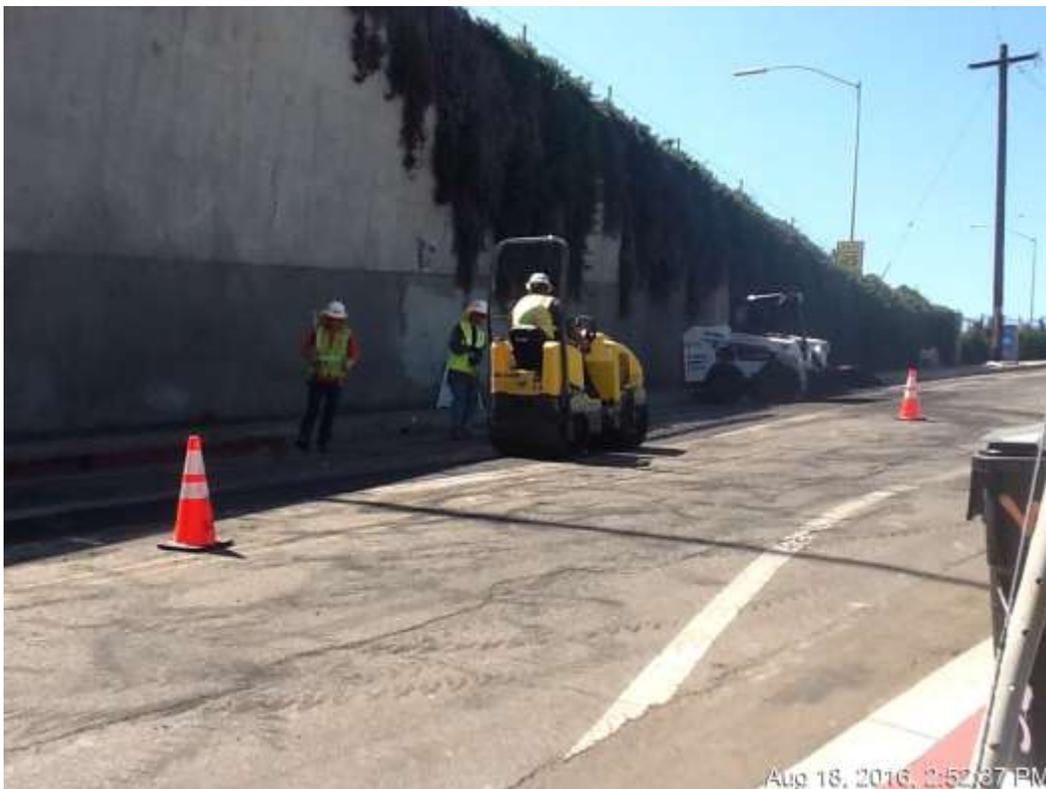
Temporary paving of the completed trench, Columbia Street 12-kV Underground.
